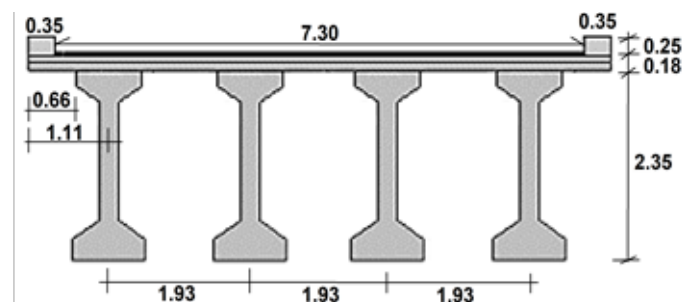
Example of vehicular bridge section for $L = 45$ m with reinforced concrete deck supported on post-tensioned concrete beams (*Dimensions in meters).
